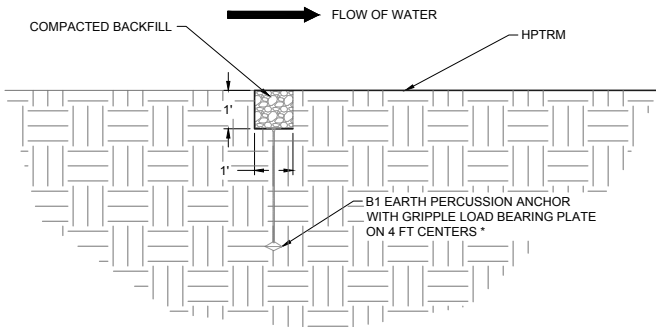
TERMINAL CHANNEL ANCHOR TRENCH (UPSTREAM) DETAIL
